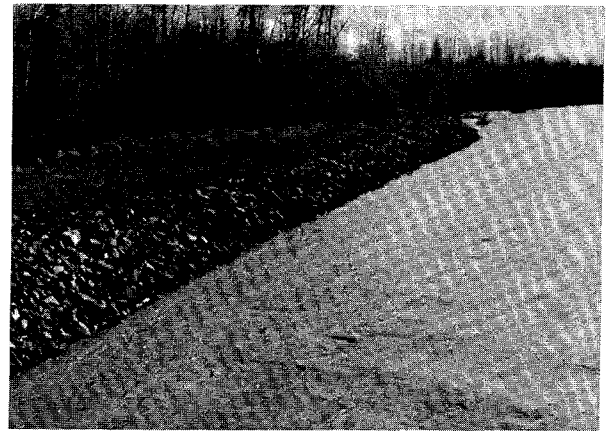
View upstream from South Santiam River bridge toward right bank. Dike is revetted with rock riprap, keyed in place. (From Oregon Dept. of Highways.)
